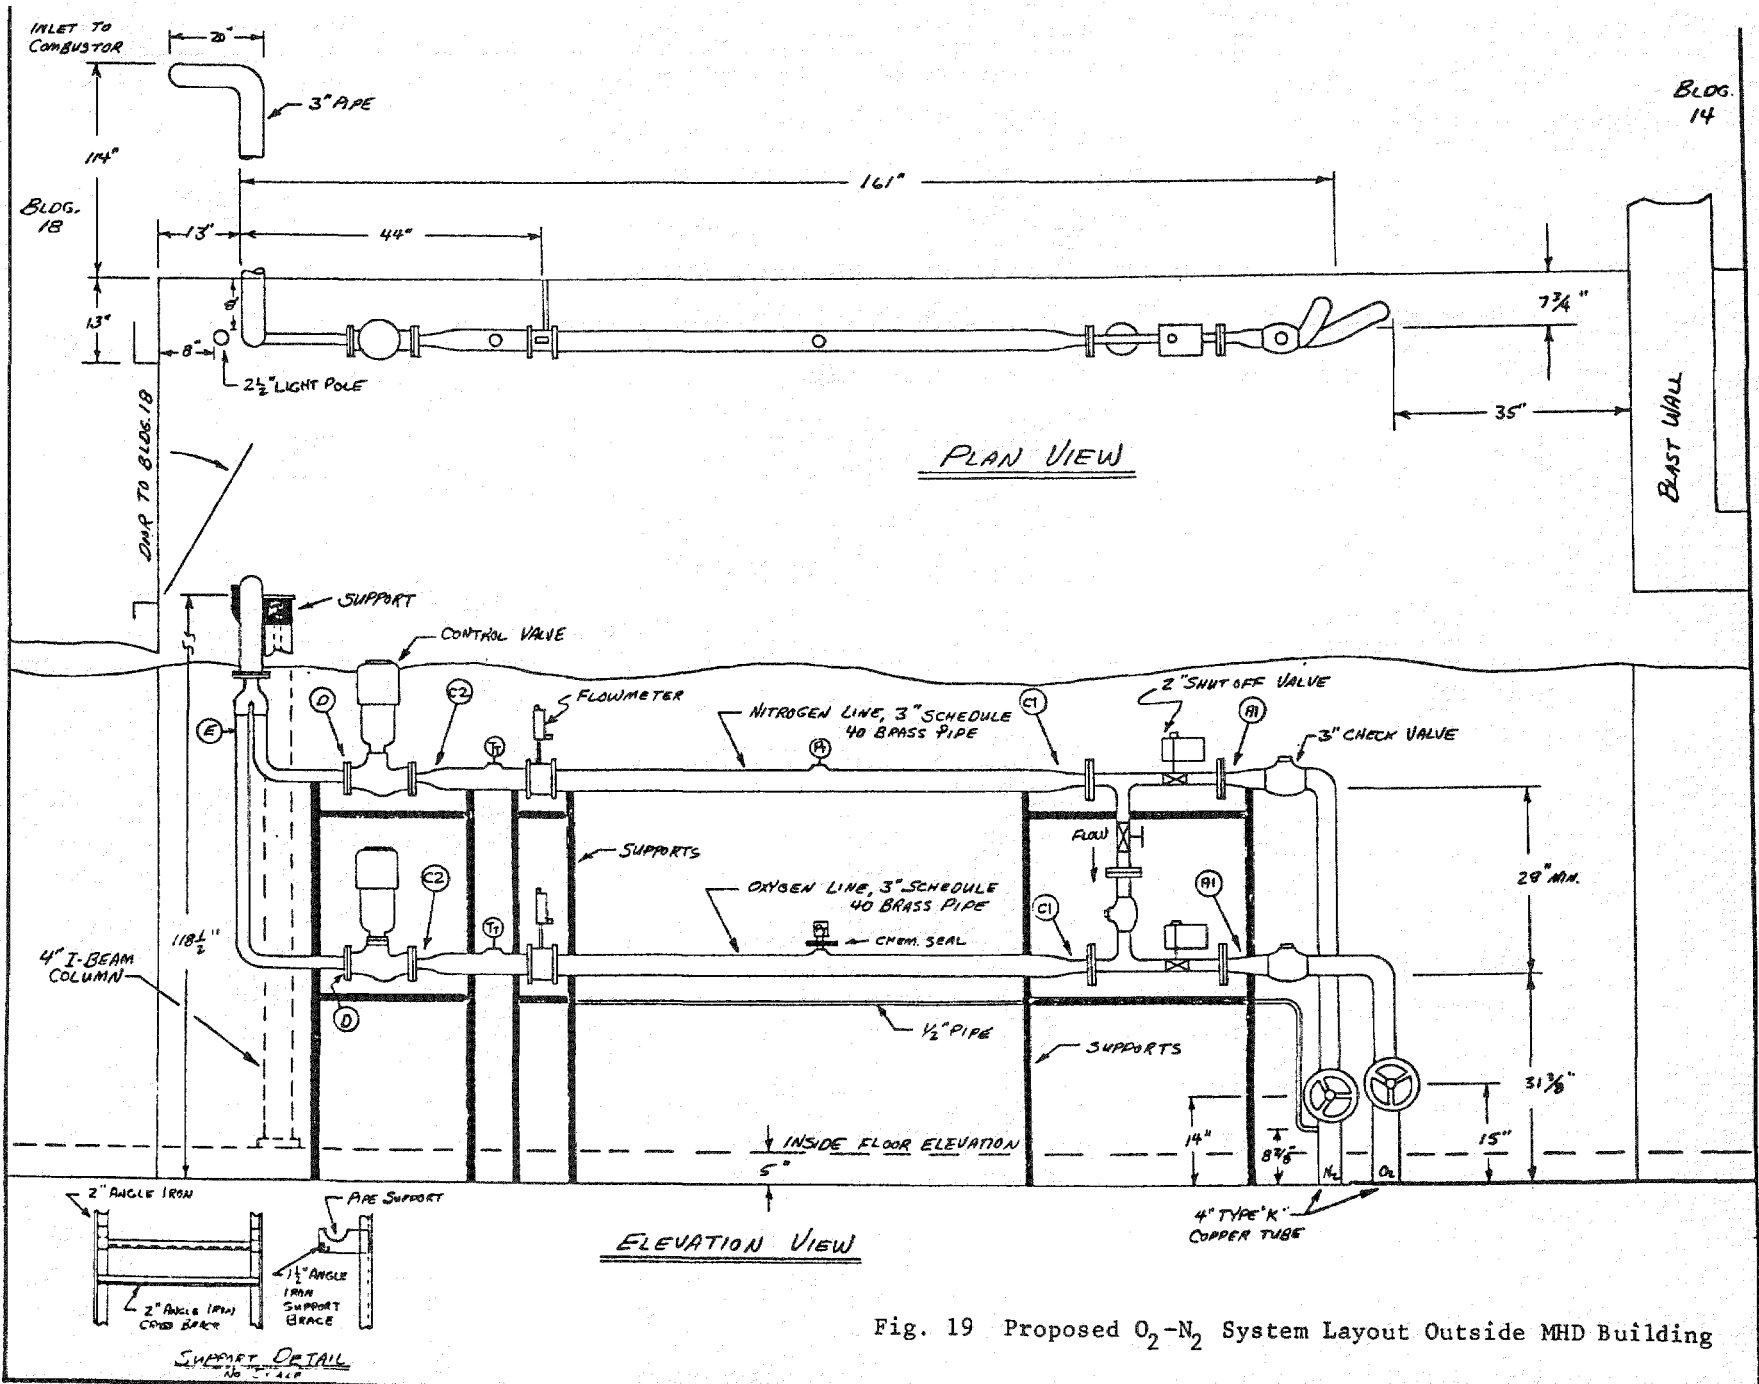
Proposed O₂-N₂ System Layout Outside MHD Building
